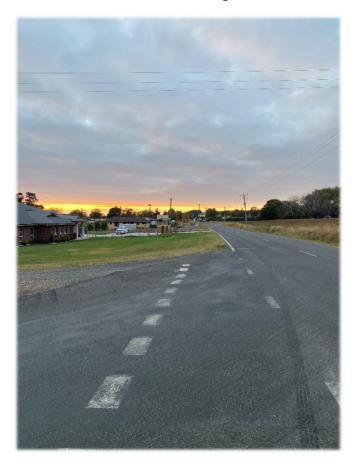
Looking onto the intersection of Porters Bridge Road and Meander Valley Road
